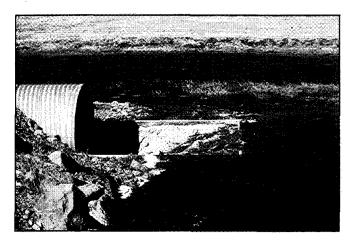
A drop inlet fashioned of railroad ties raised the inlet elevation by 32 inches. The concave concrete trough accelerates flow into the pipe for improved hydraulic efficiency.
